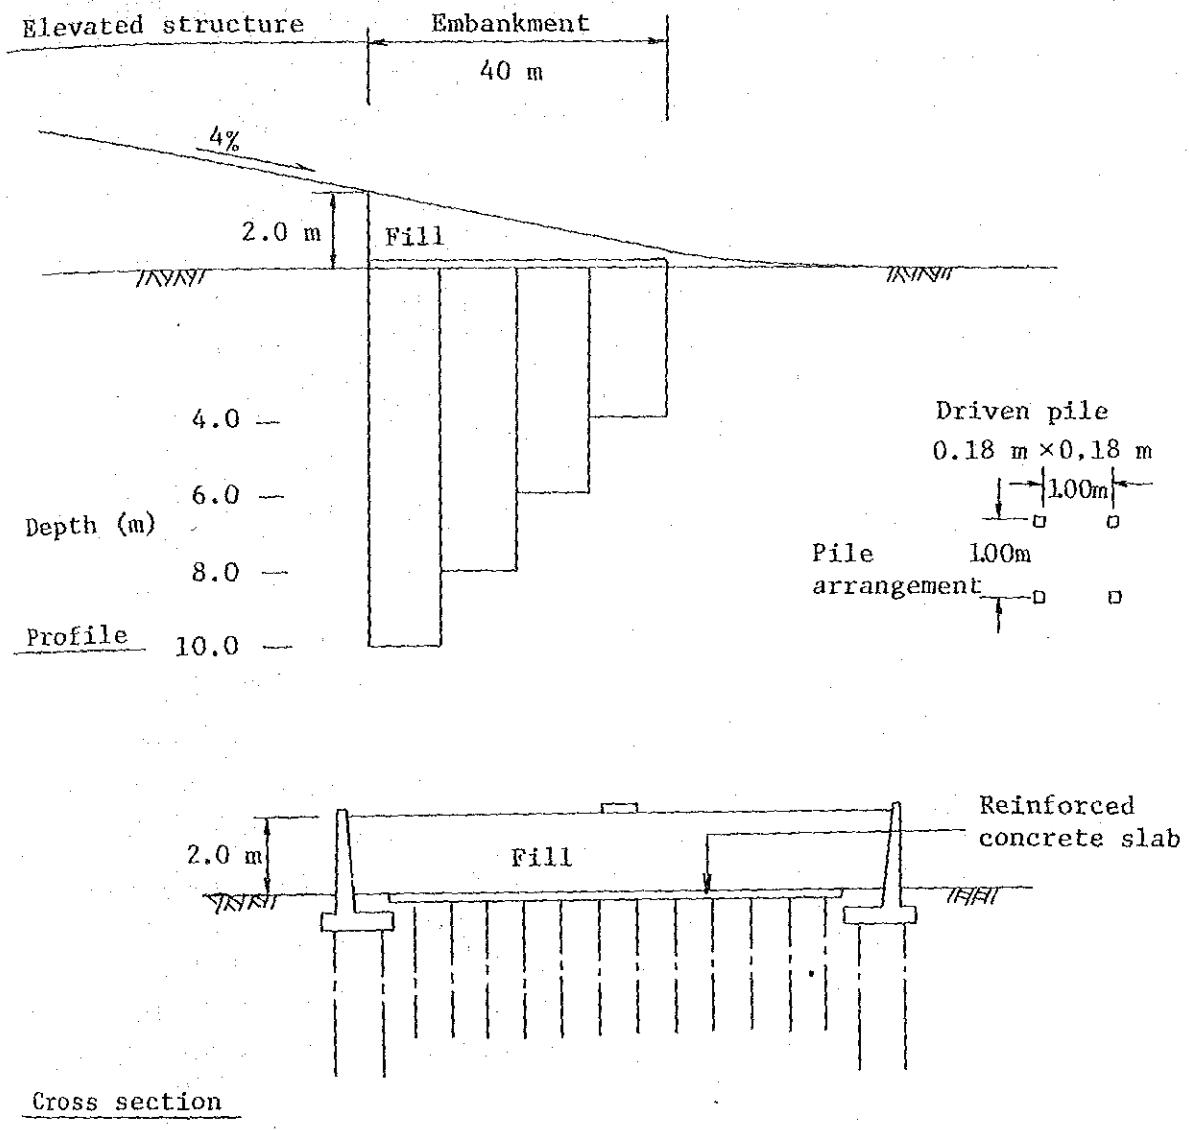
Embankment with Bearing Unit and Retaining Wall
